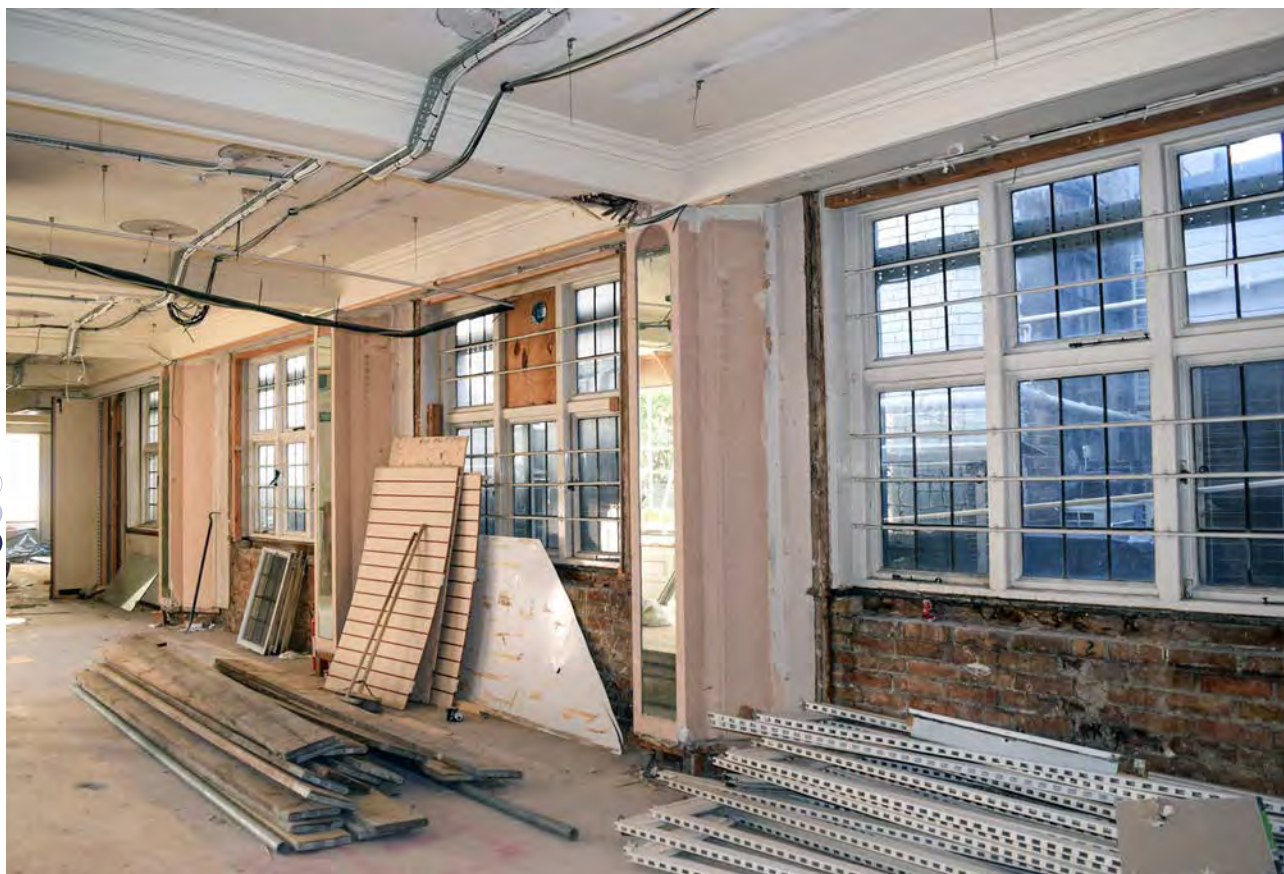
The first floor of 31 Cornmarket Street, looking north-west
